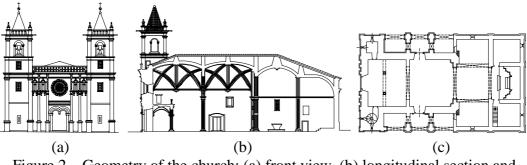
Geometry of the church: (a) front view, (b) longitudinal section and (c) plan section
